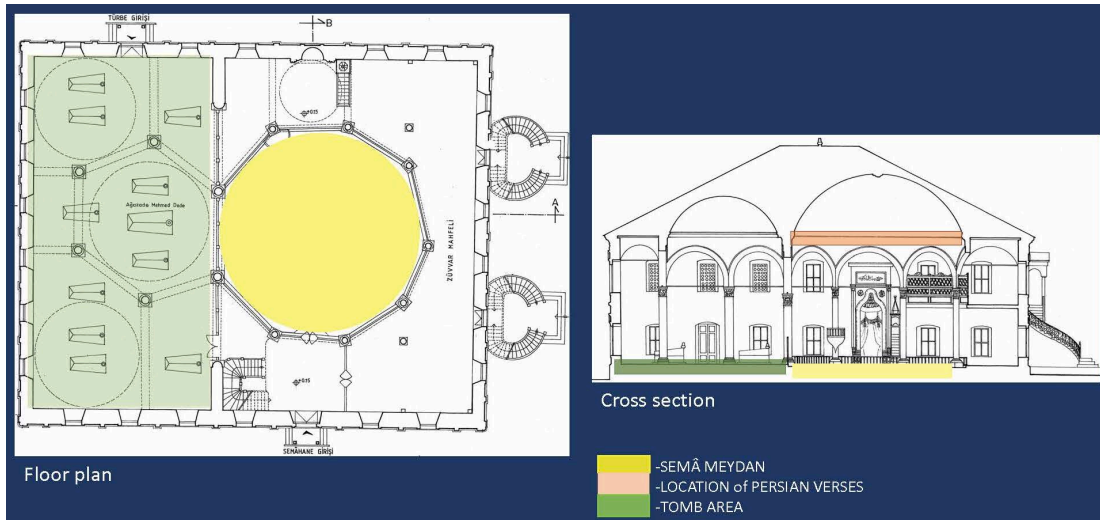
Plan and cross section of the Gelibolu Tomb-Semâhane building showing location of the *Samâ' Ghazal* in the rim of the dome over the semâ meydan (Restitution drawing by B. Tanrıkorur)
